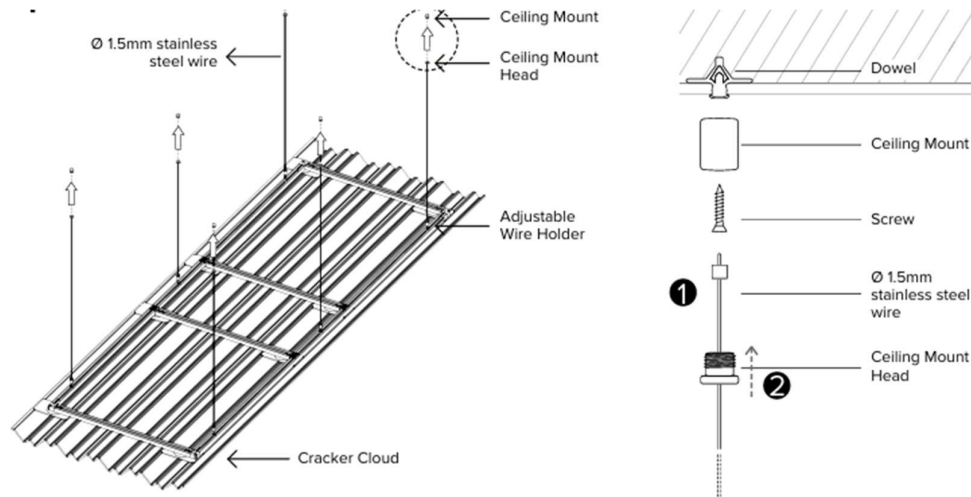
Application of the PET-Felt recycled acoustic panel on the ceiling: The ceiling mount head is attached to the suspension wire. Secure the ceiling mount and ceiling mount head to each other.
